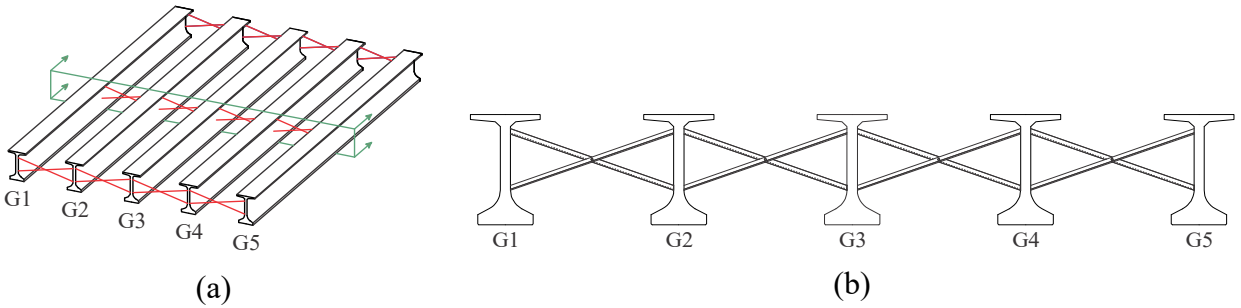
Bridge cross-section with interior midspan *steel* X-bracing: (a) Isometric view; (b) Cross-section at the midspan
